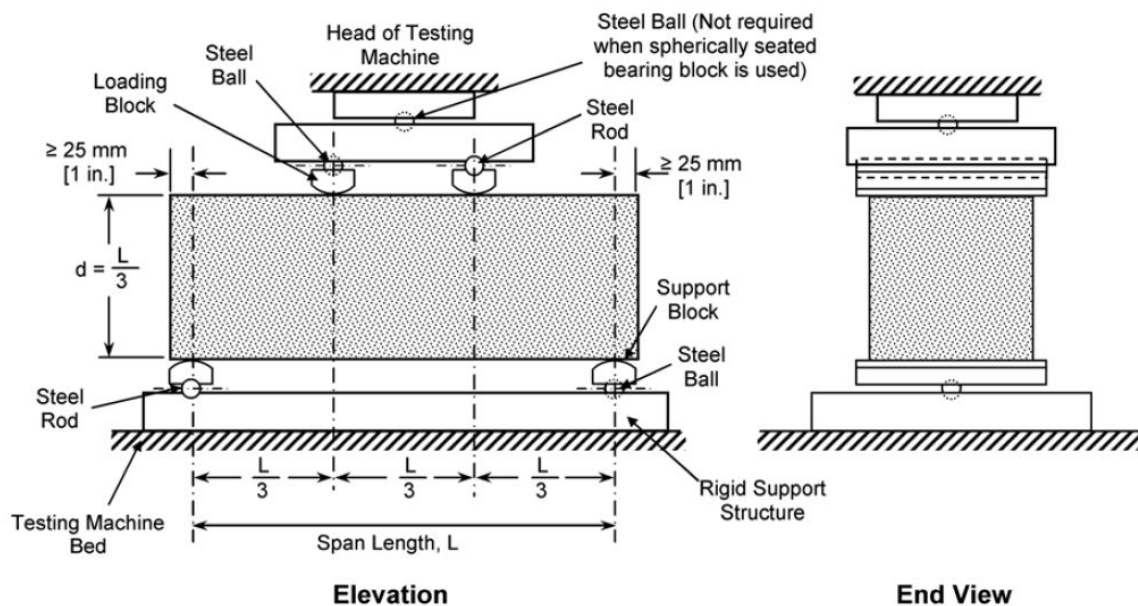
Setup of Concrete Flexure Test from ASTM C 78 (ASTM International, 2010)
